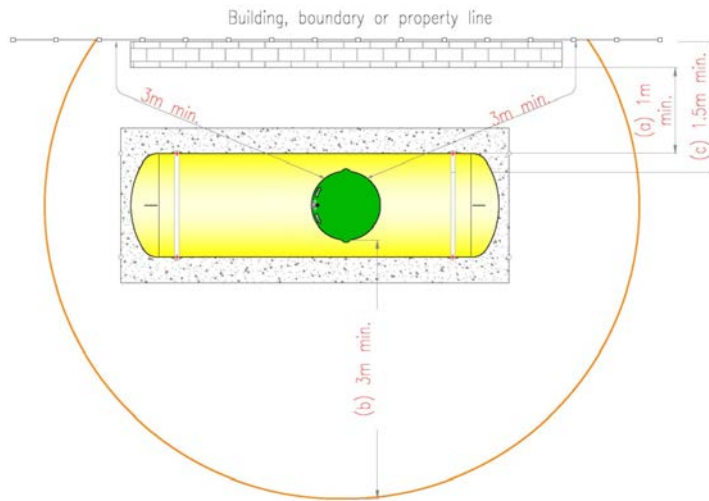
Below ground tank siting arrangement with gas dispersion wall
